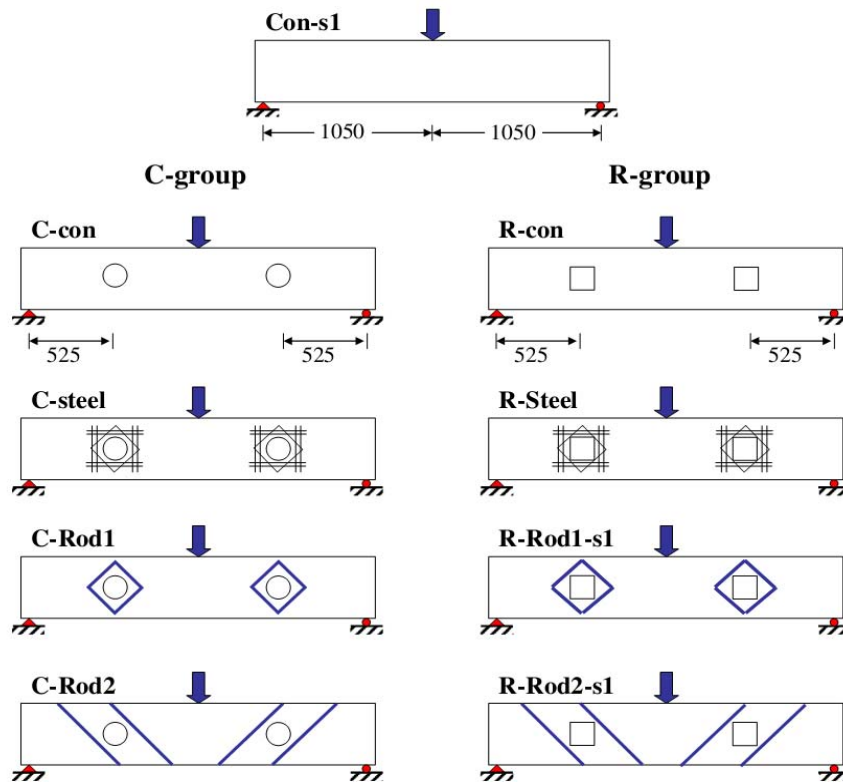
Strengthening RC beams with opening by externally installed FRP rods (Amorn Pimanmas 2010)
